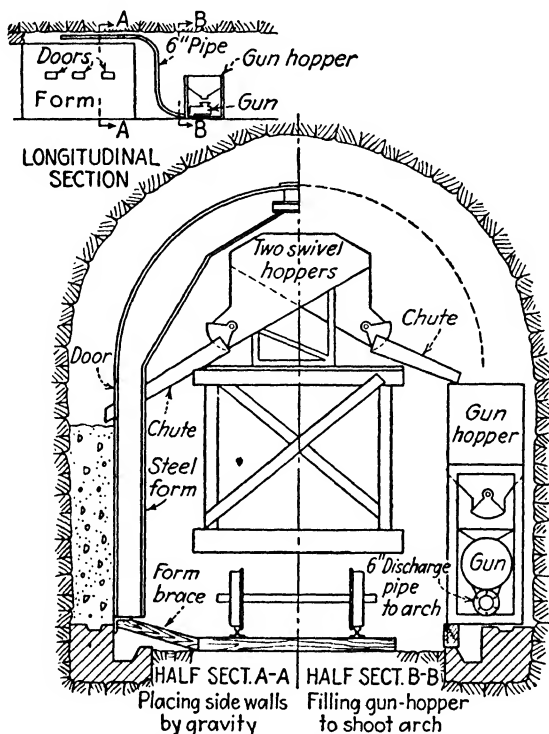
Typical method of concreting a single-track railroad tunnel. Concrete is carried into the tunnel in two 4-yd. hoppers on the scaffold car and can be discharged into either the side walls or the gun hopper.
